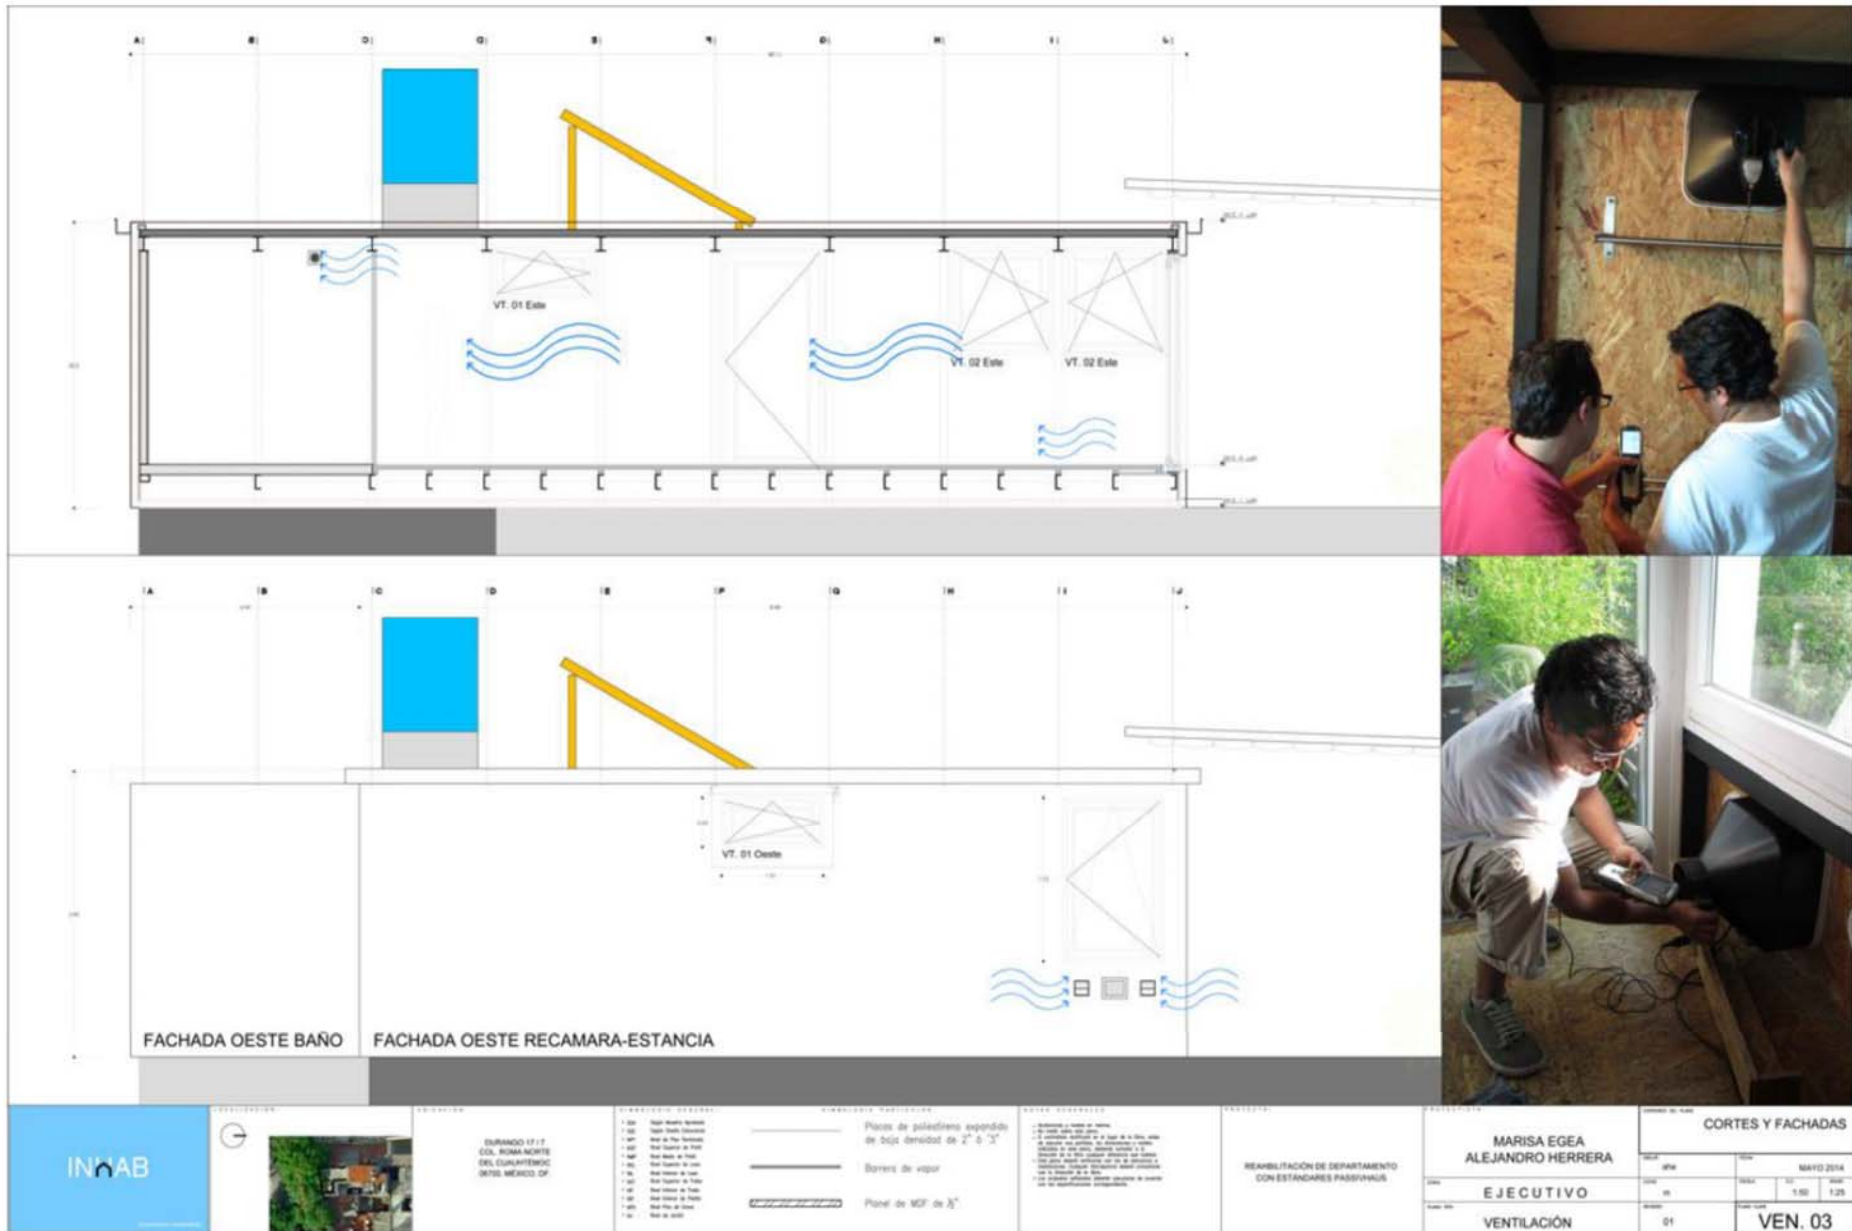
Section looking at the east wall (top) and western elevation (bottom) of the ventilation strategy for MX-PH.
